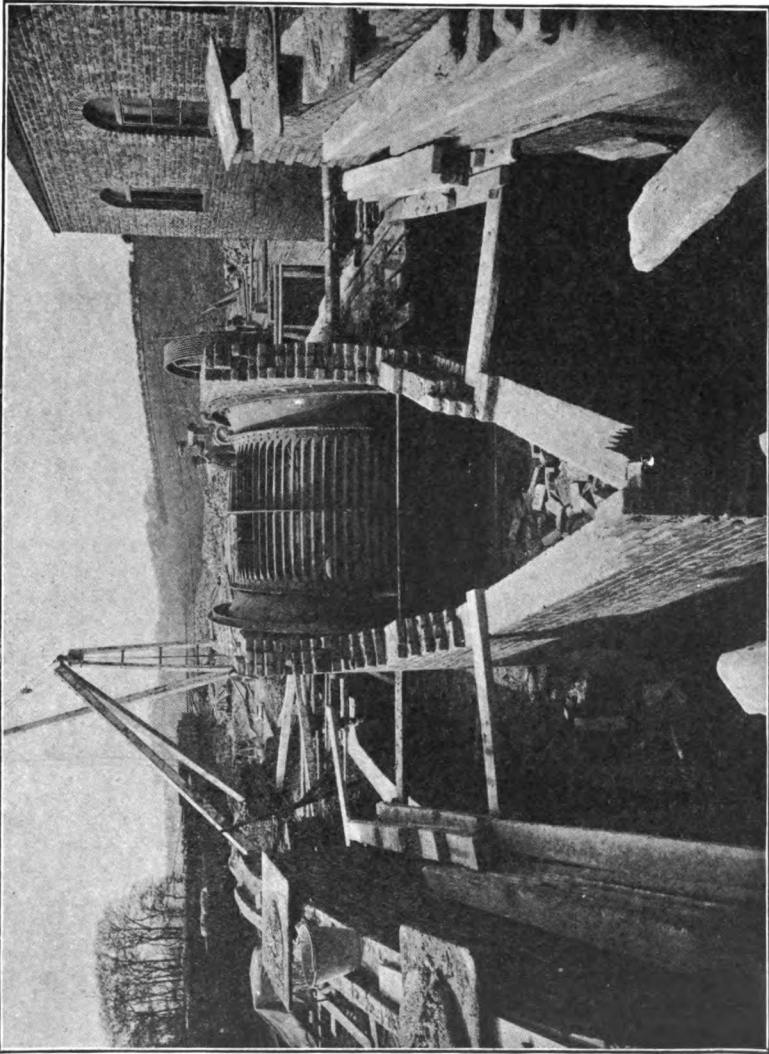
Double-inlet Sirocco Fan placed in position : Fan Buildings in course of construction.
